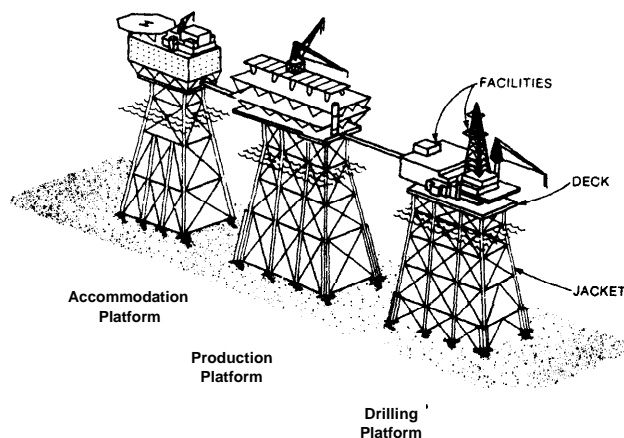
Typical Lattice Type Structural Details of A Platform Jacket
